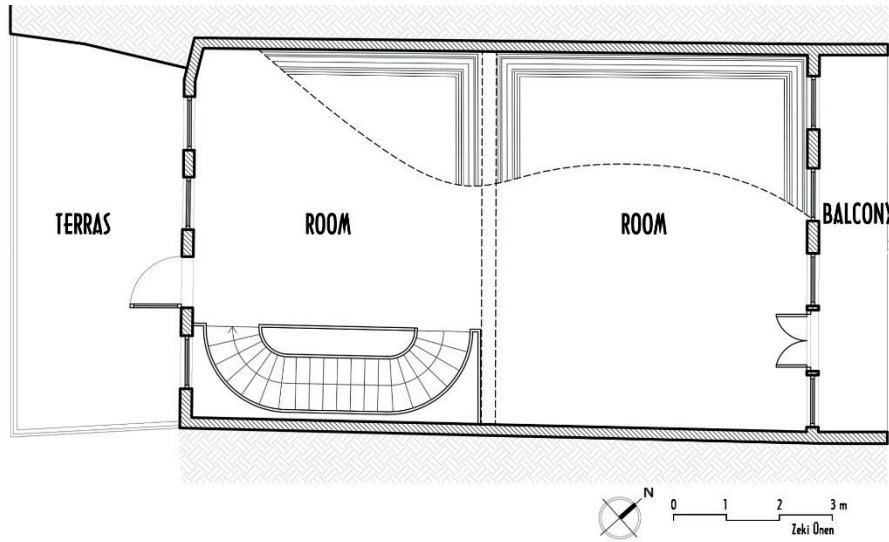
Ground Floor Plan of Augustos House (Zeki Ünen Archive)
